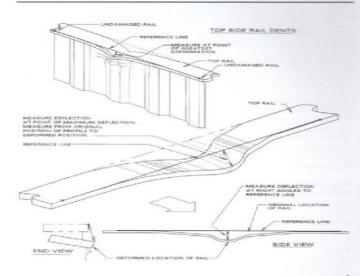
/Measuring localized damage to top rail. See Section 4.2.1.
